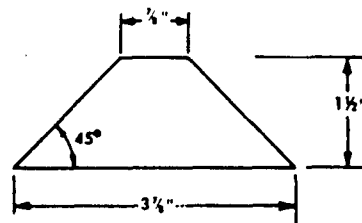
Prototype grating reconstructed from Nevada Test photos and drawings<sup>1</sup> (typical section detailed).
